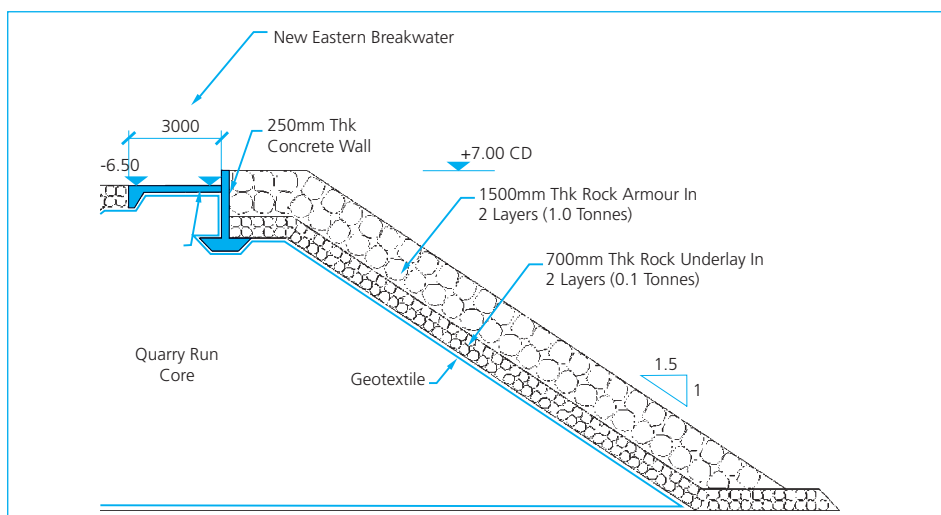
Cross-section of proposed traditional breakwater construction (Malachy Walsh & Partners, 2008).
